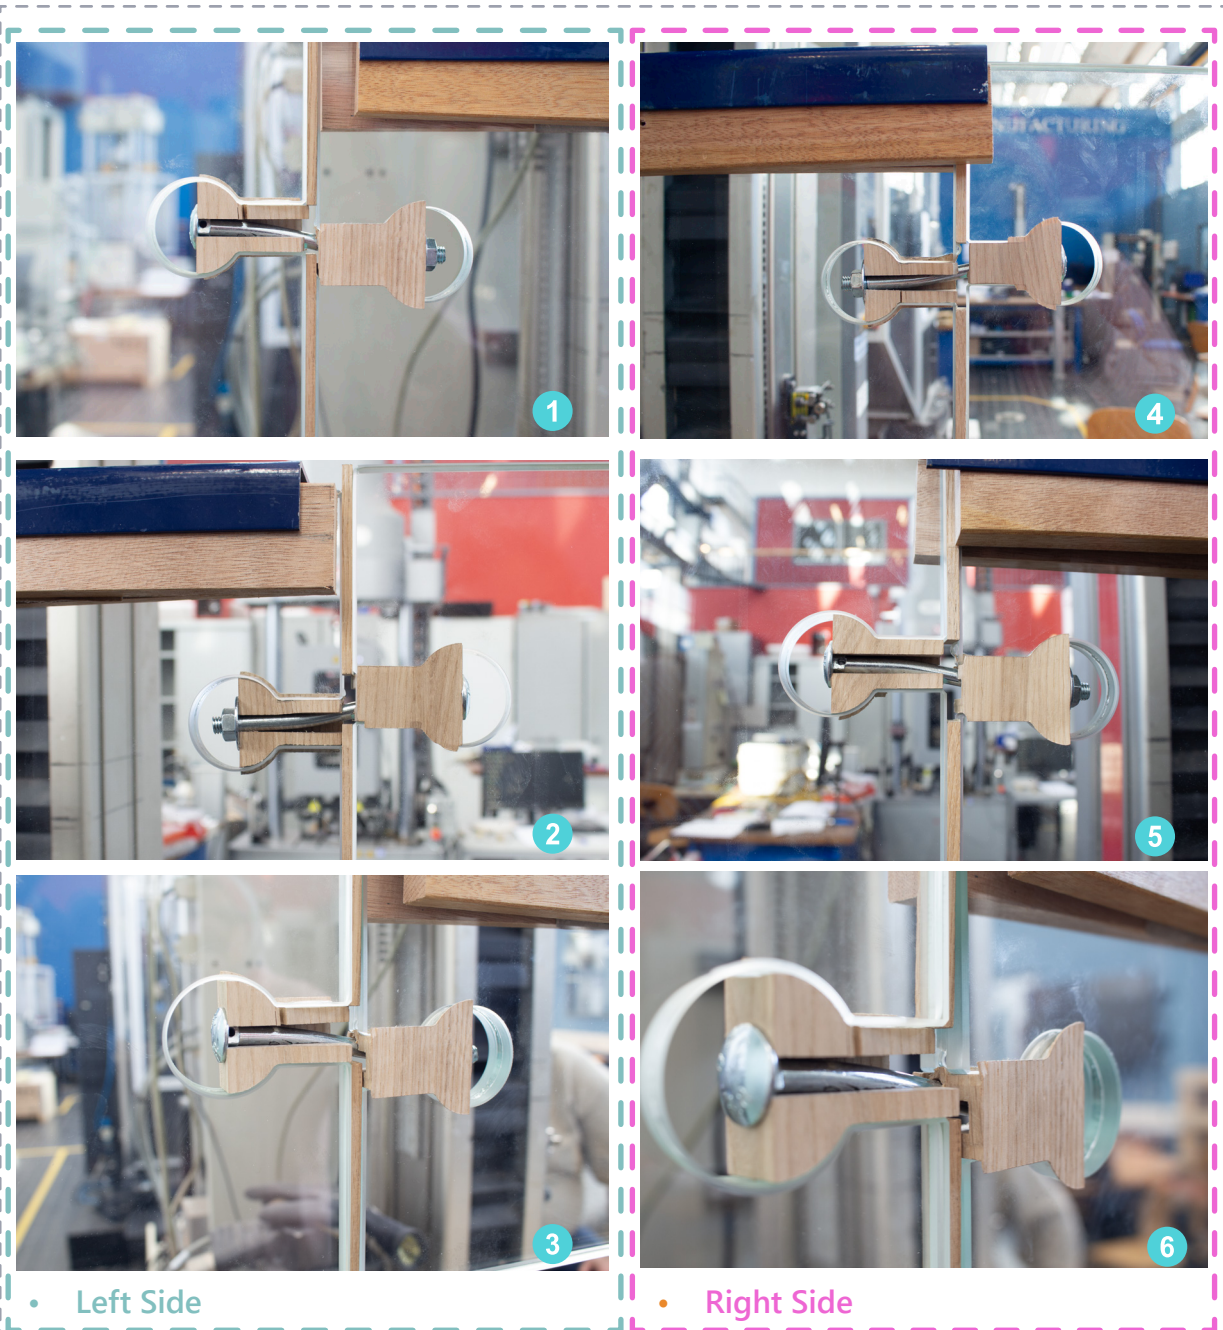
,69,1)Front view of the left joint: visible cracking in the wooden connector of the side (fin) module. 2)Rear view of the left joint: no breakage observed, but minor bolt rotation occurred. 3)Perspective view: bolt visibly bent, wooden flanges crushed under pressure. 4)Front view of the right joint: failure occurred in the wooden connector of the middle module. 5)Back view of the right joint. 6)Perspective view of the right joint: wood tearing visible, with the lamination between the two glass panels due to compression. Source: Author's own.
